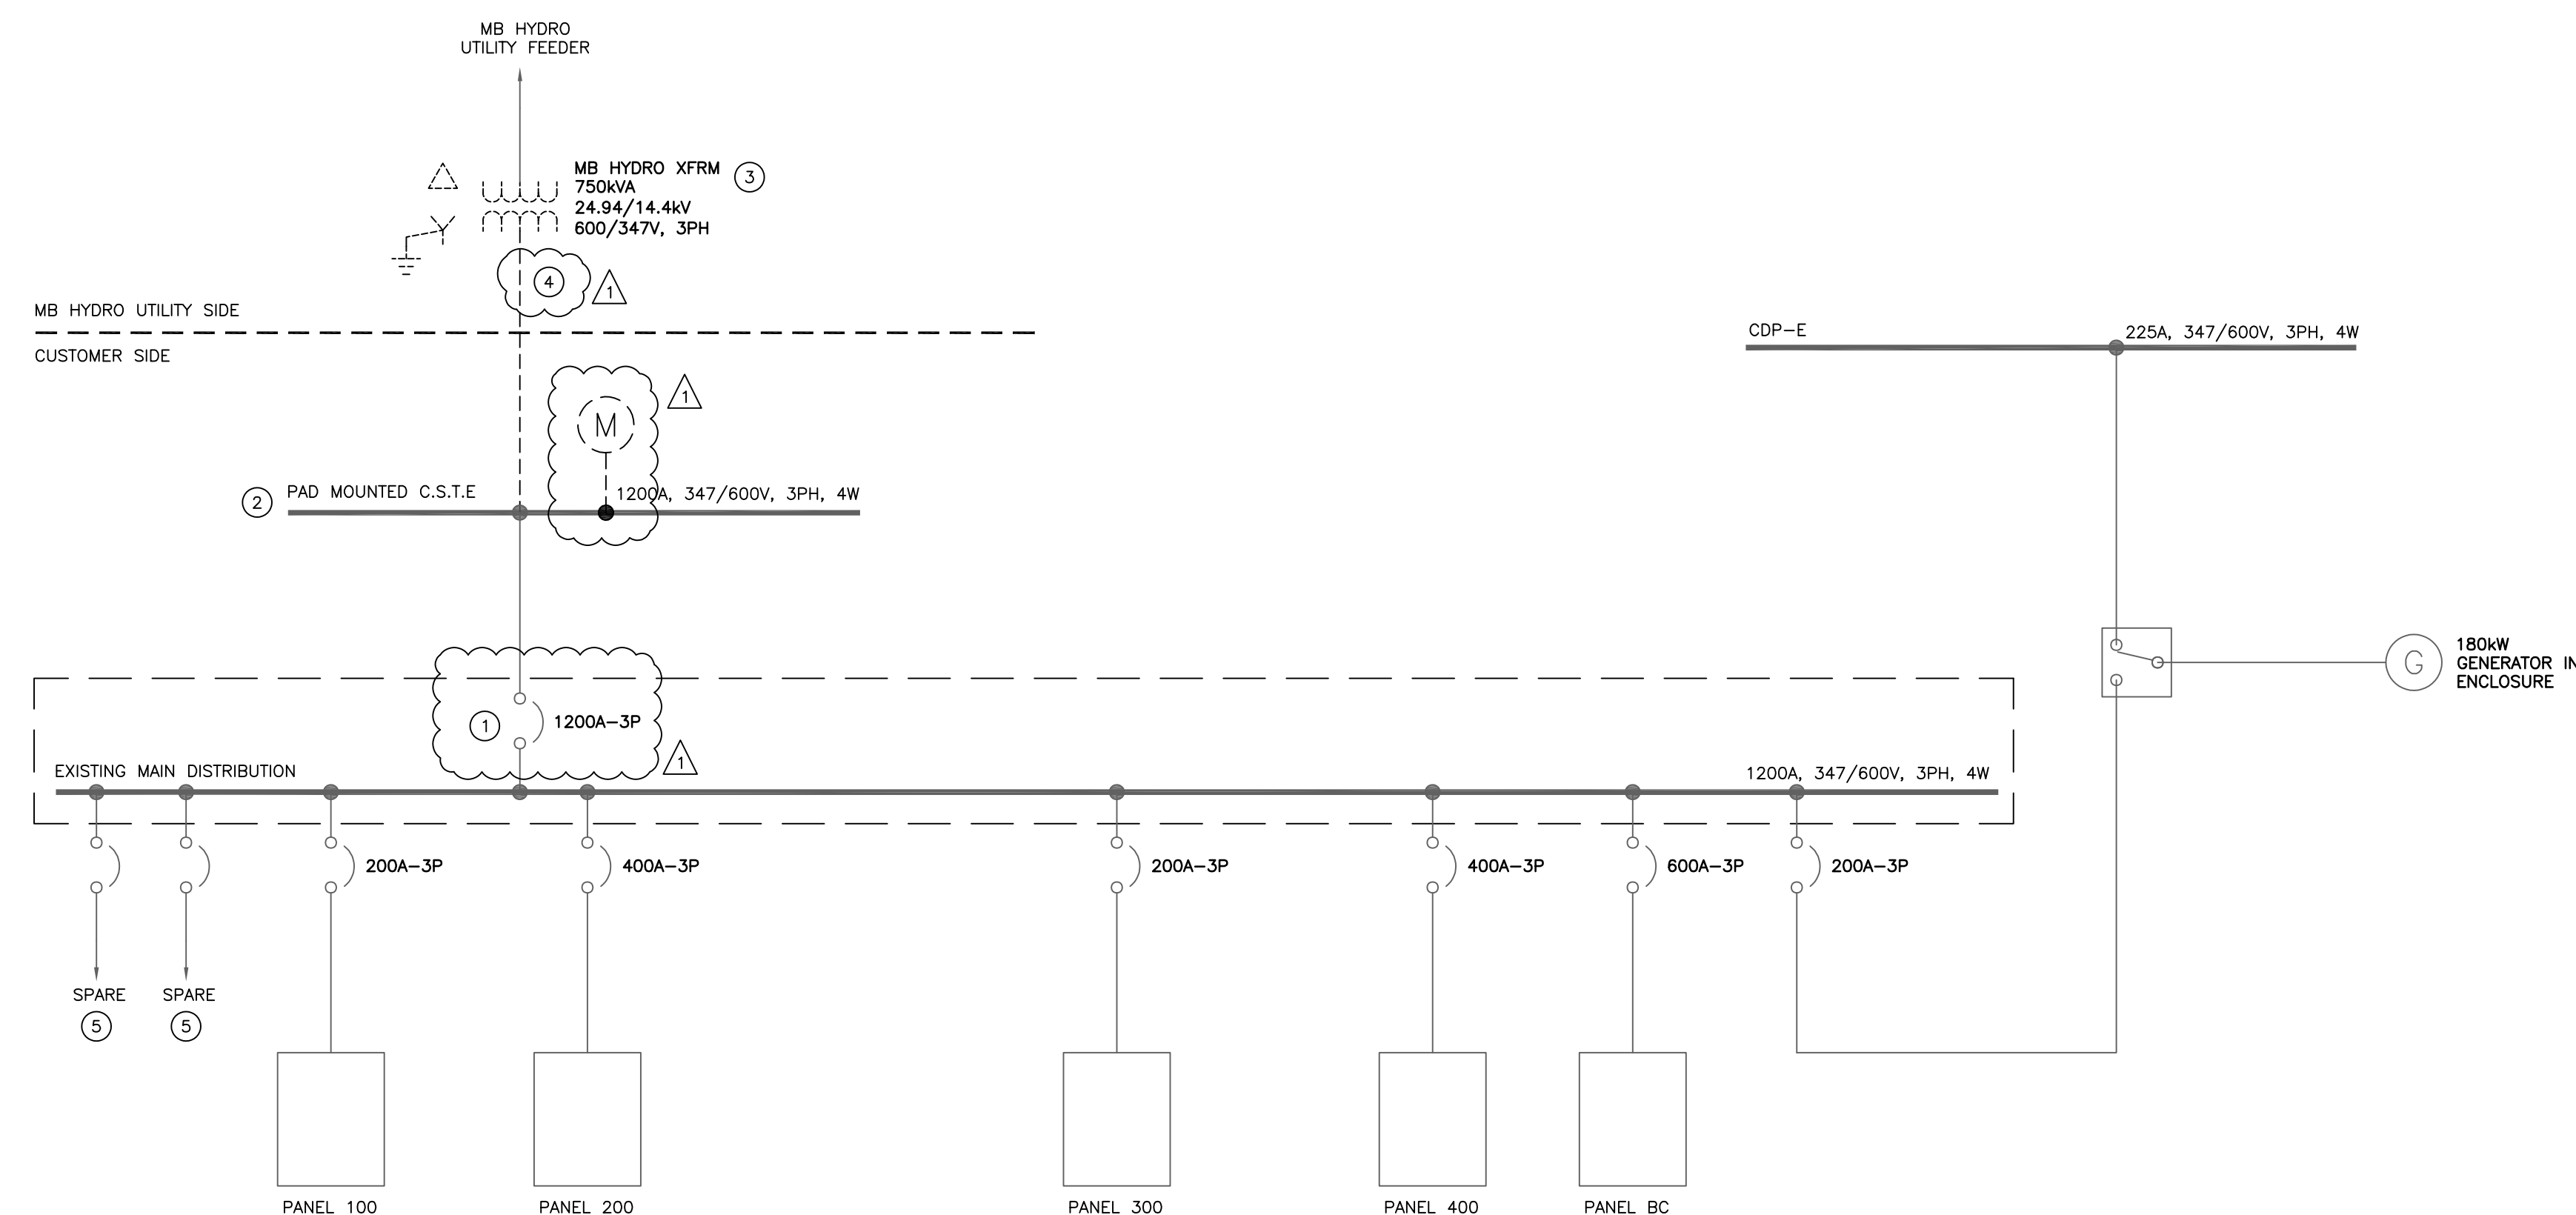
Sheet	9 of 12	Revision	1
